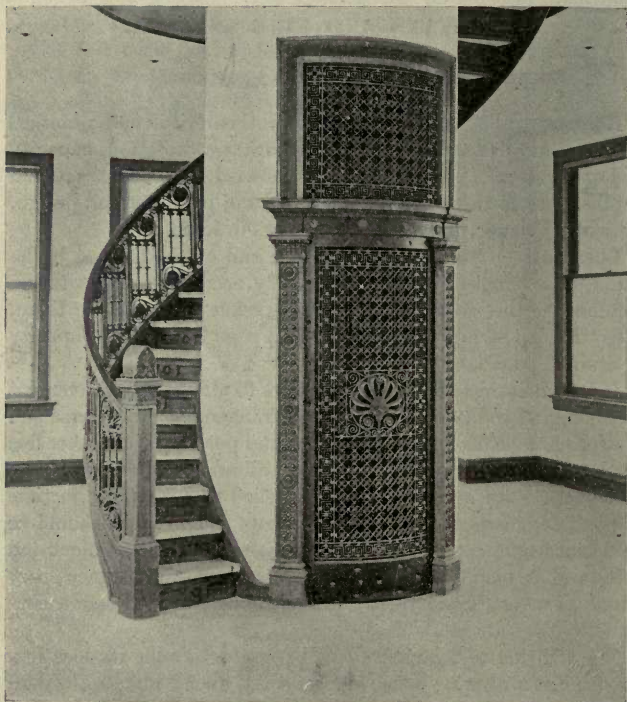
Circular Stairs around enclosed Elevator Shaft.
